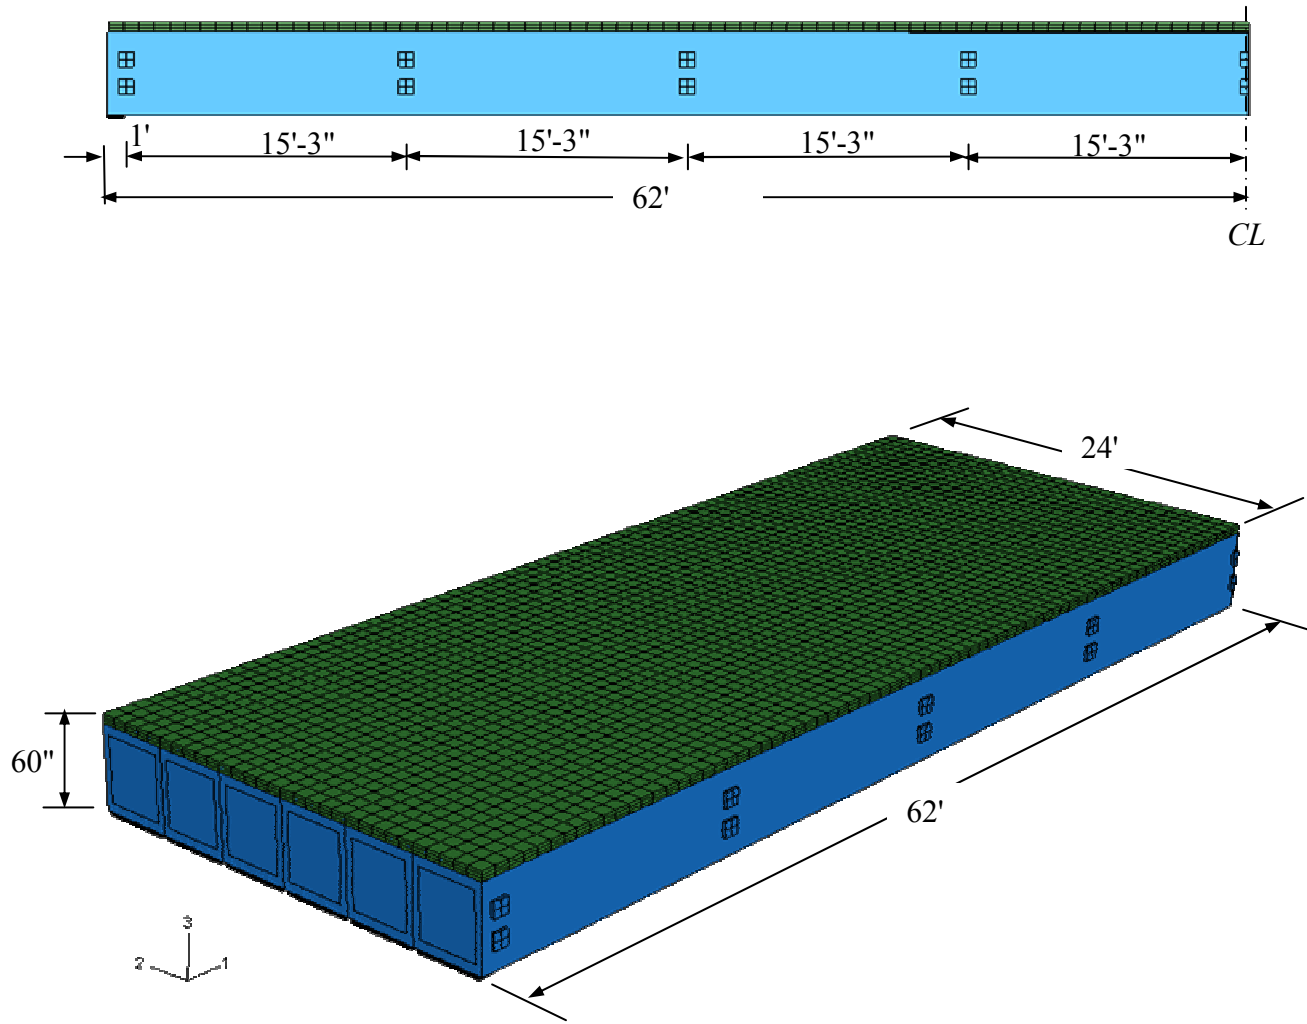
Modified assembly of 124 ft span bridge model.
